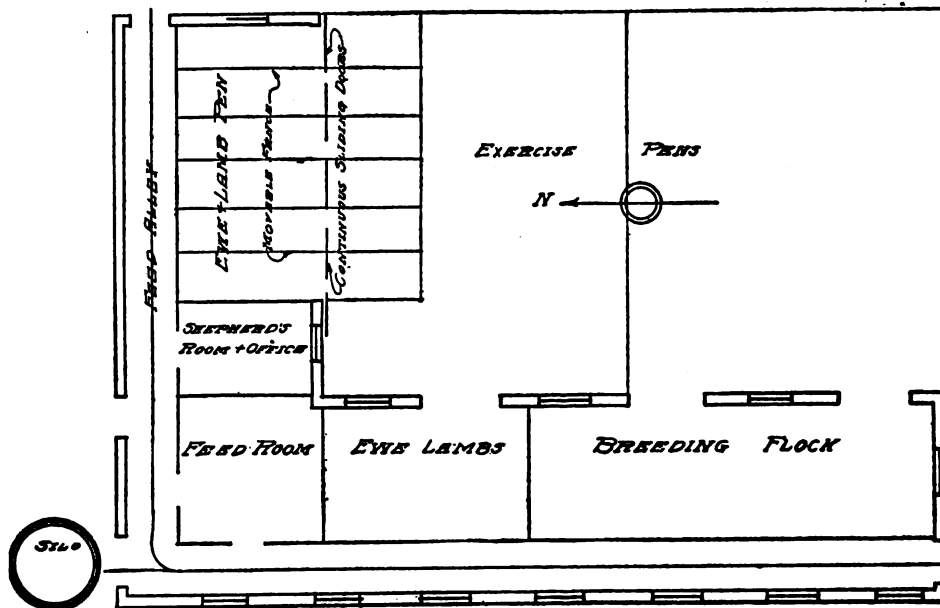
Sheep barn plan. Sheep need but little protection from cold, except at lambing time, but they must be kept dry and given yard room where they can obtain plenty of exercise
